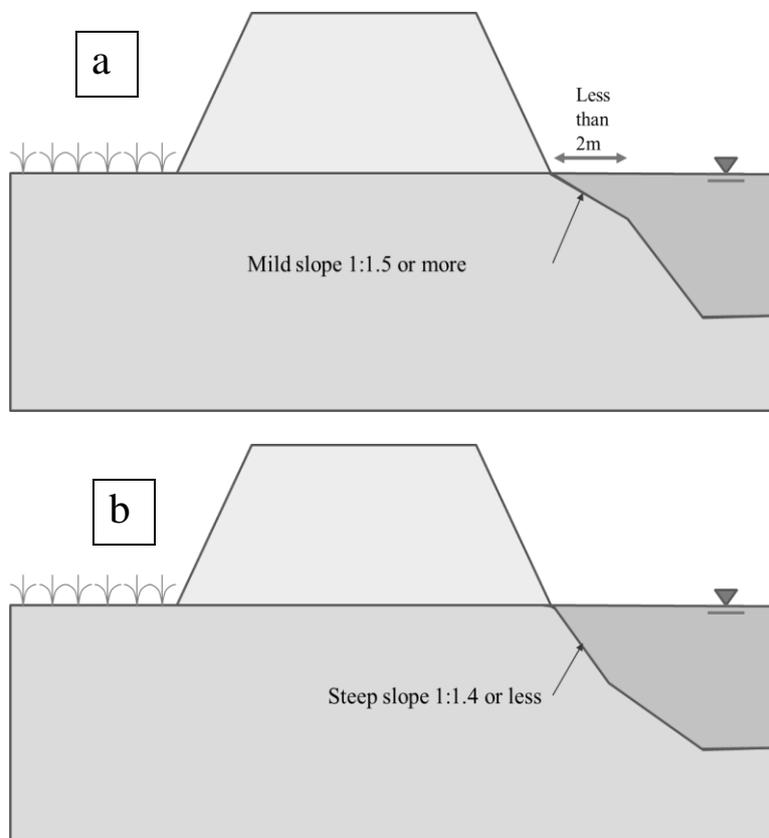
Challenging Condition; (a) situation with less than 2 m wide mild slope under toe of embankment (b) situation with steep slope under toe of embankment
